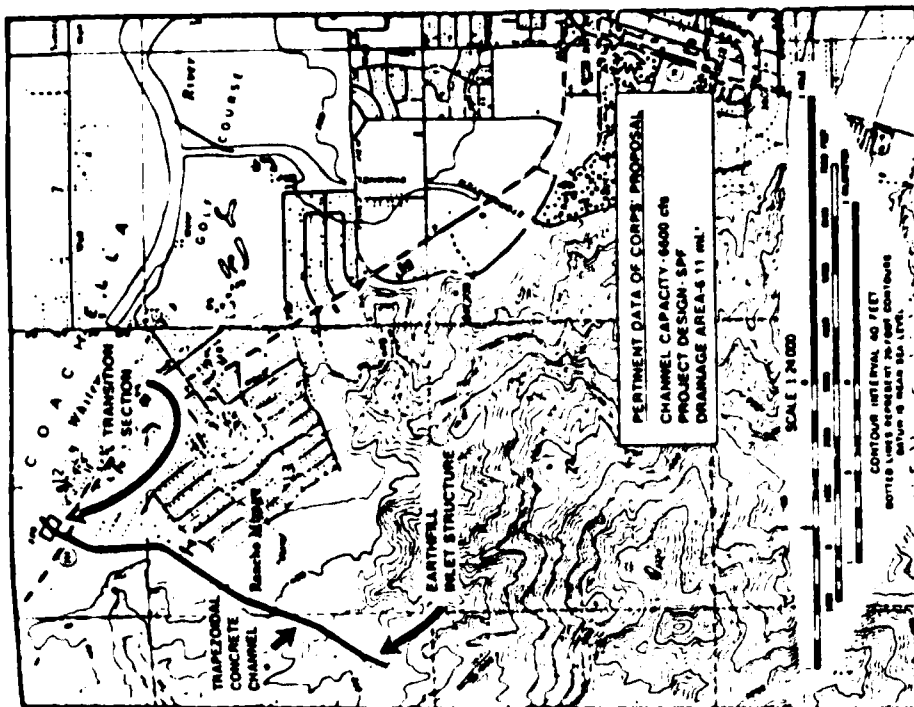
Approximate Project Alignment for Plan 4 Earth Fill Dam
